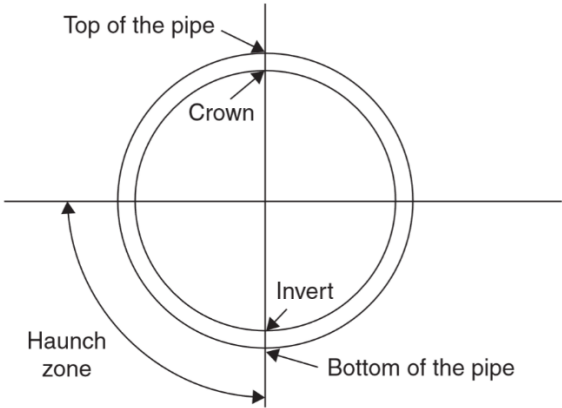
Pipe cross-section terminology. (Source: Najafi, 2010)
